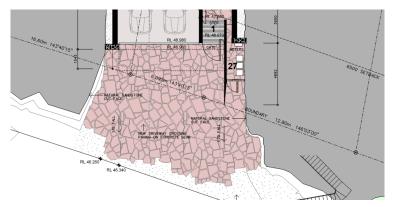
Extract of basement level 0 showing the proposed garage storage room at '27' (Source: HSA)
